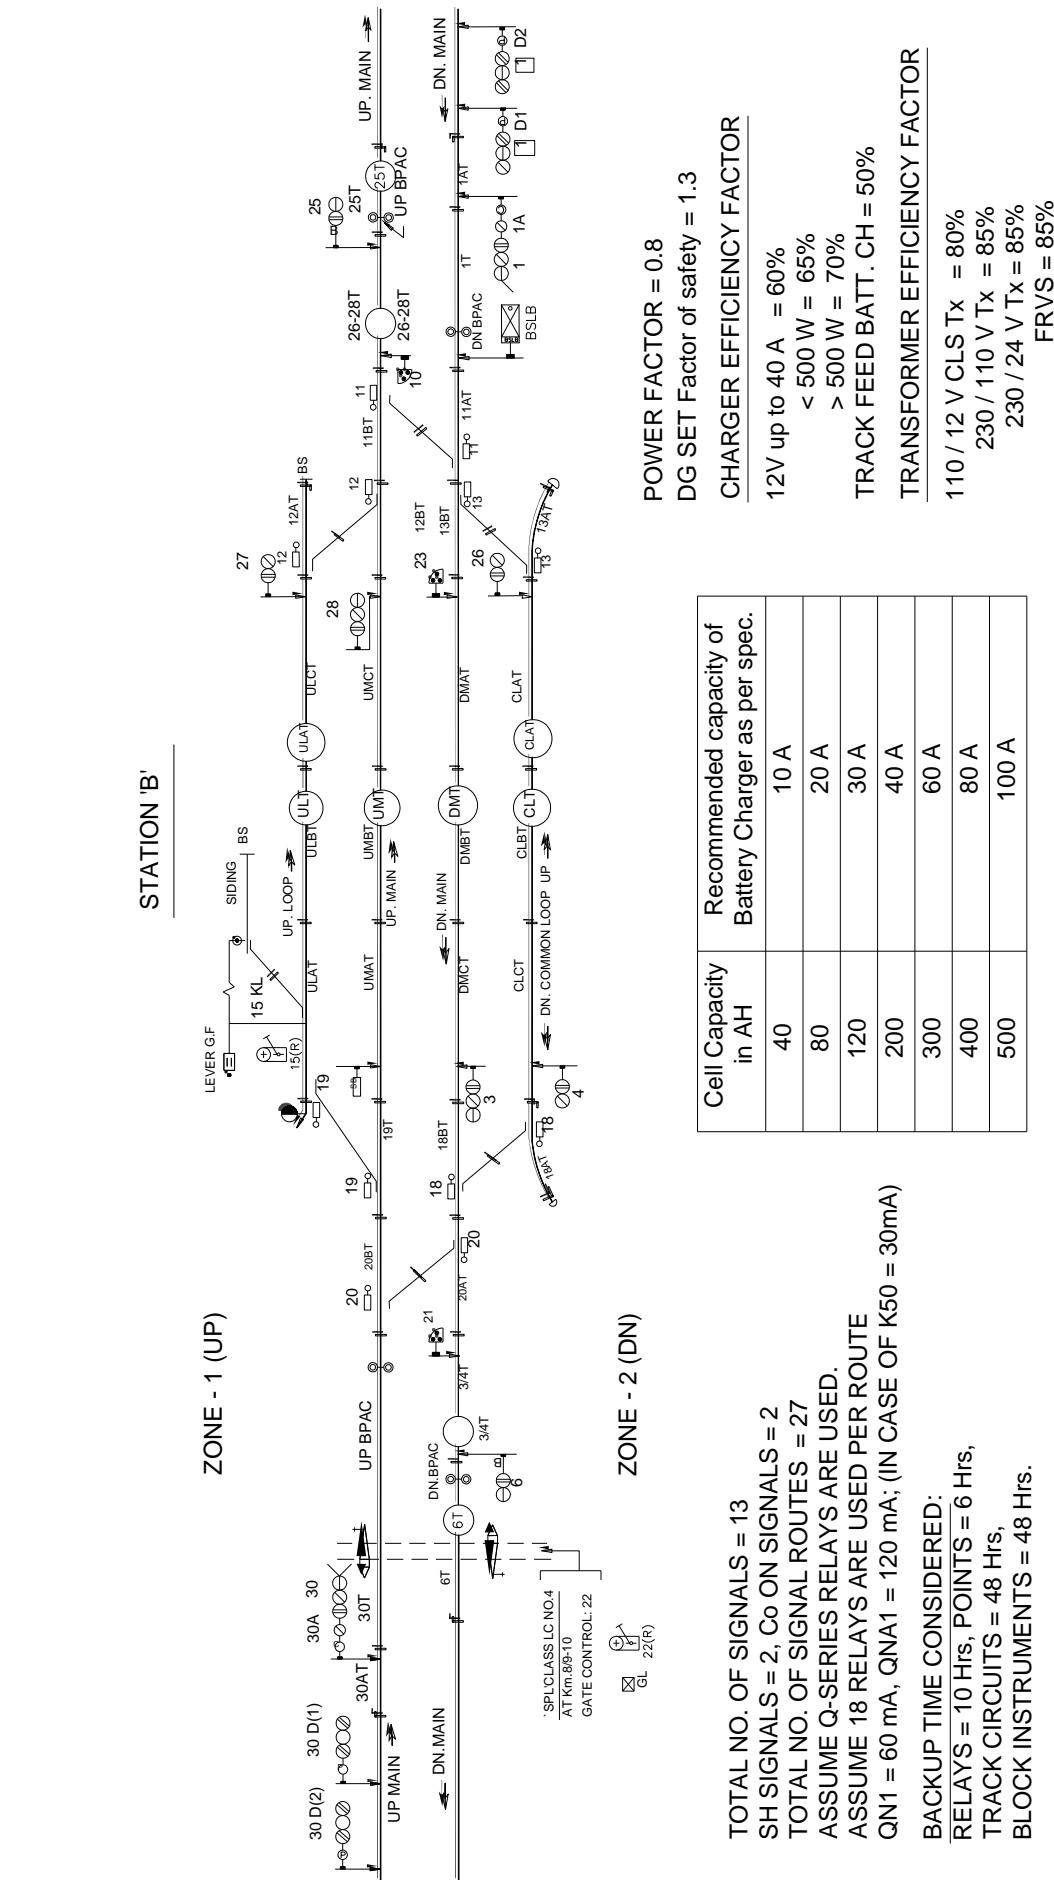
POWER LOAD CALCULATION FOR 4-ROAD PANEL INTERLOCKING STATION
